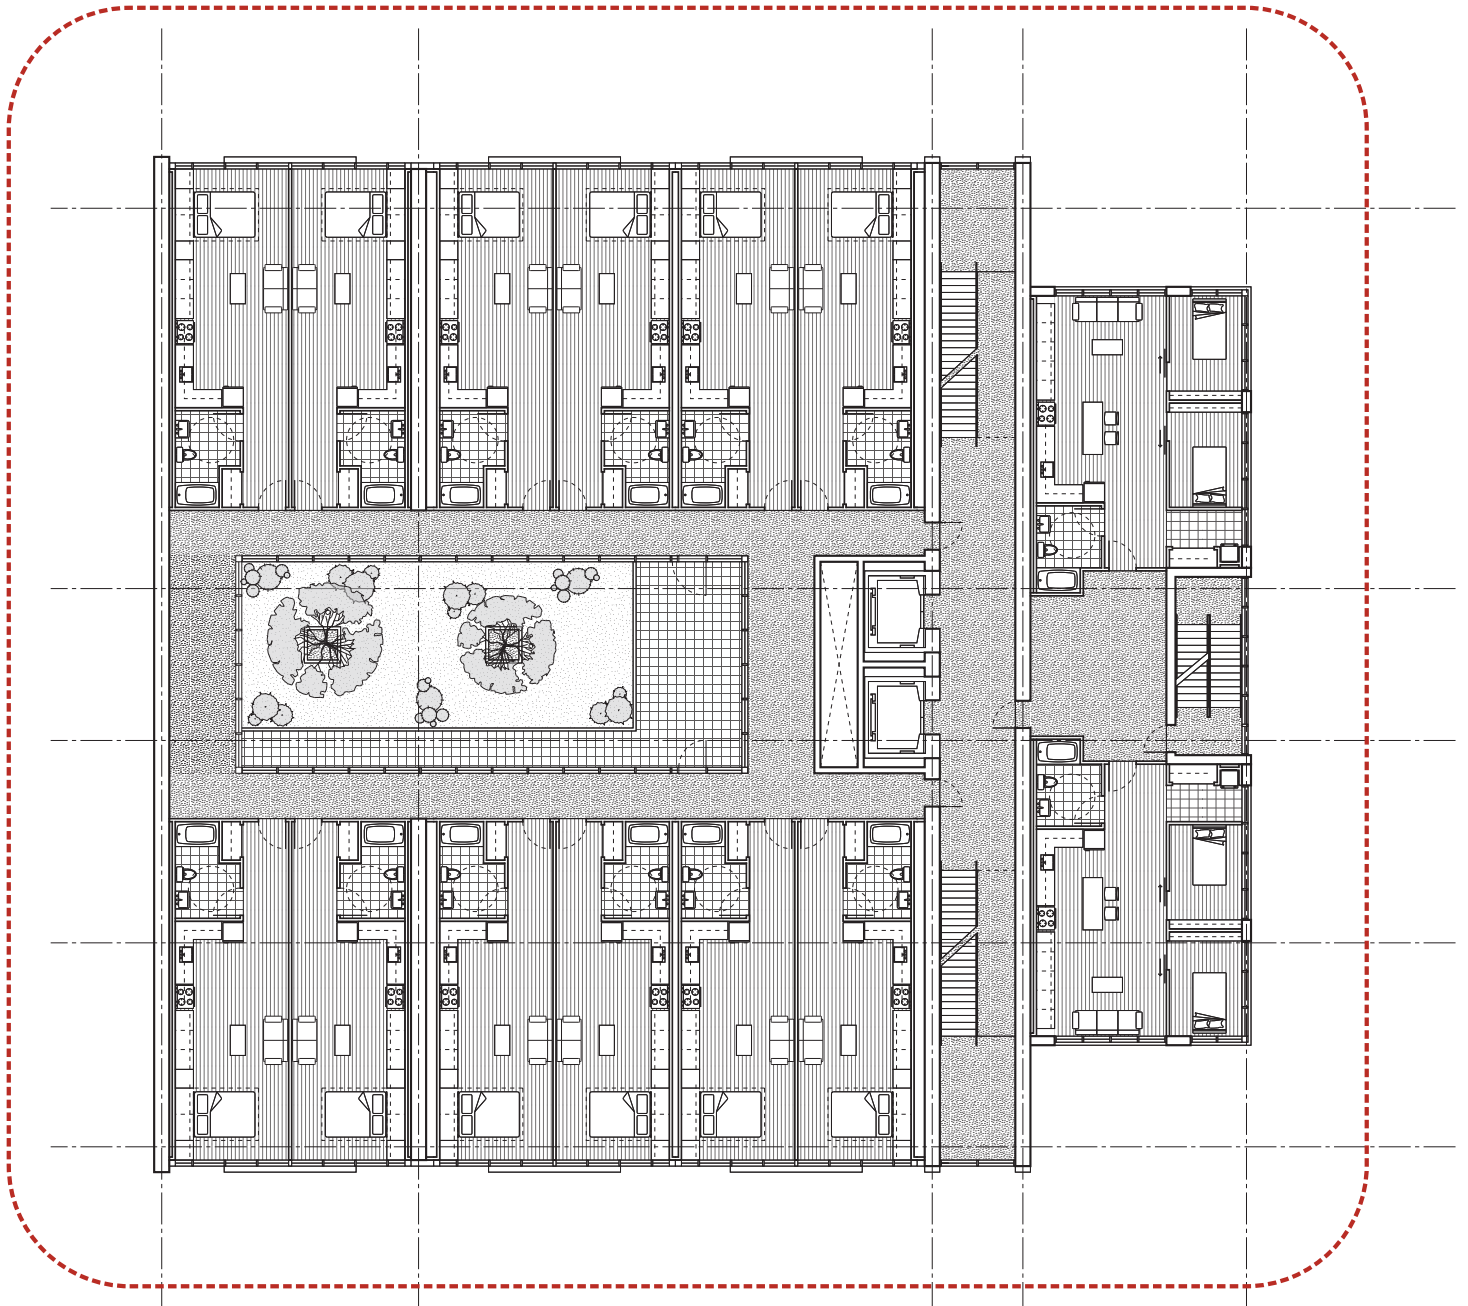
Resource Centre, 2nd Floor Plan (3rd Floor Similar).
